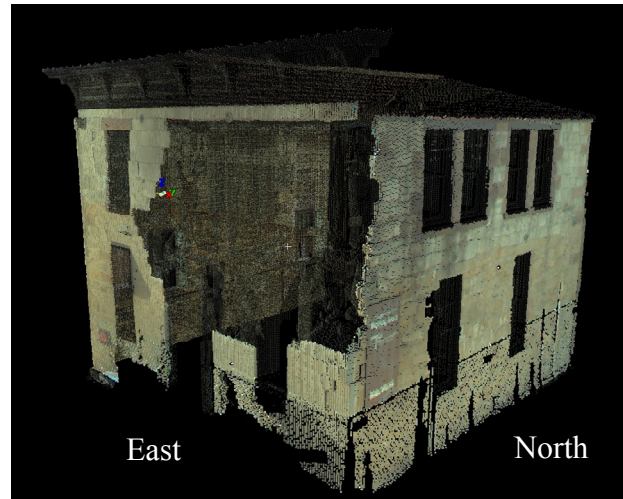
Damage observed in the building after the 2014 South Napa earthquake
